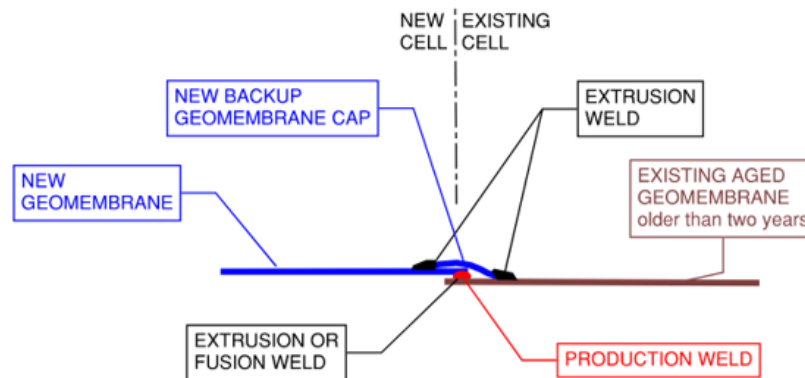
Location of Production Weld in Tie-in Seams to Existing Geomembrane
